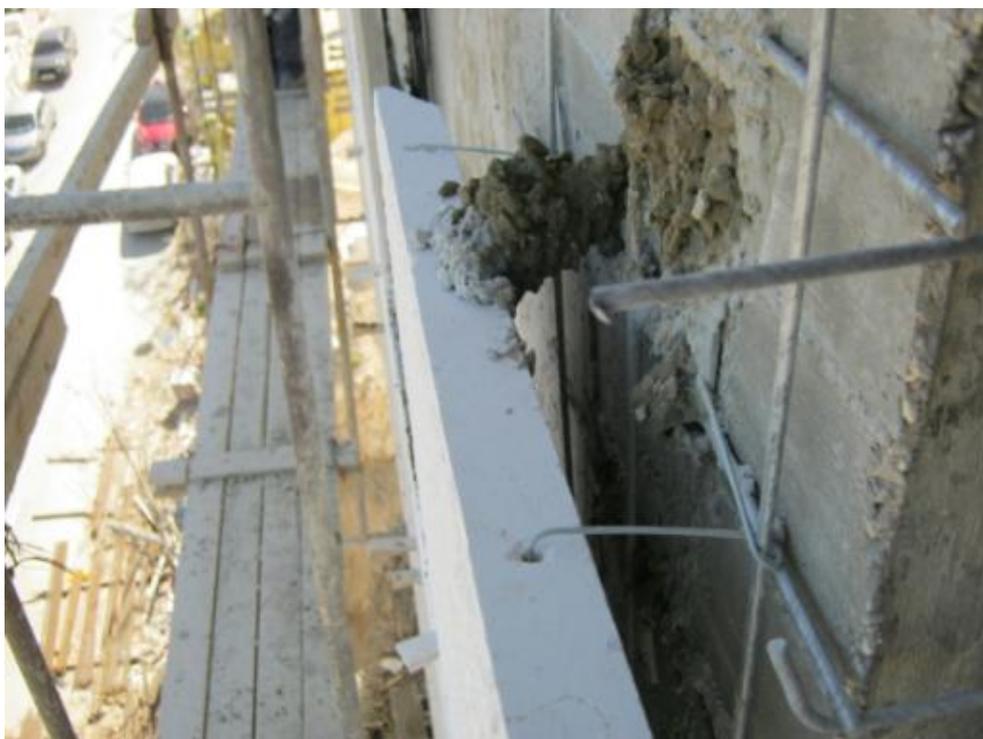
Typical Method for Fastening Stone Cladding to a Shear Wall Building
